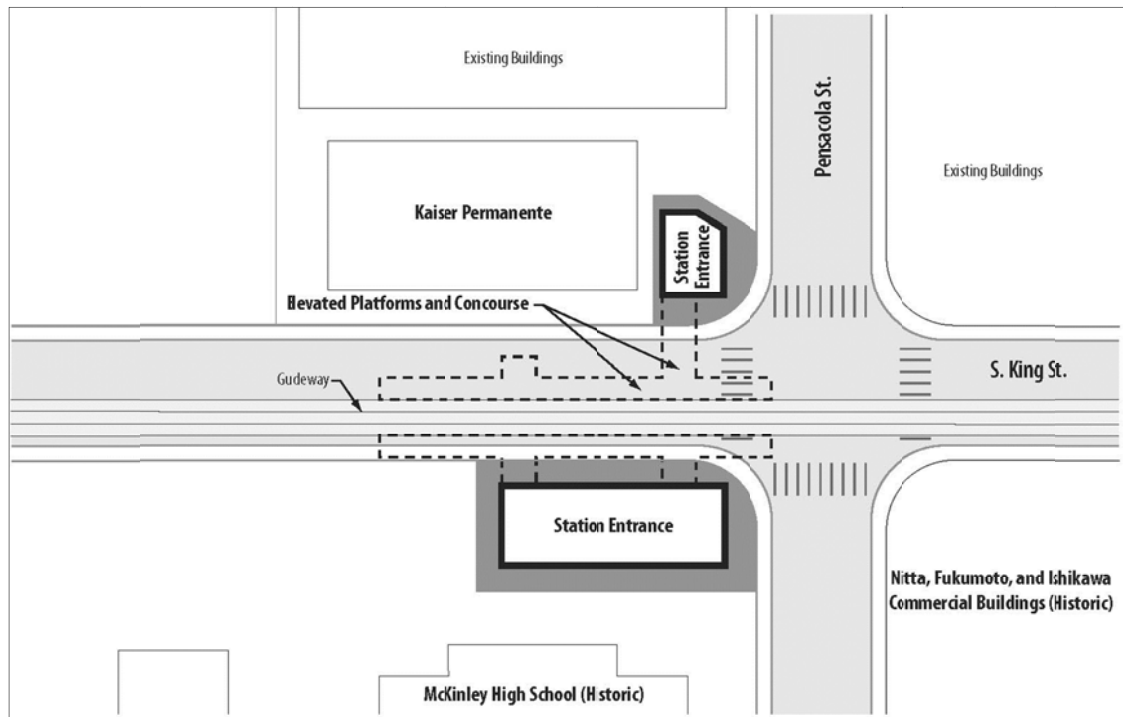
Beretania Street Tunnel Alternative Pensacola Street Station
